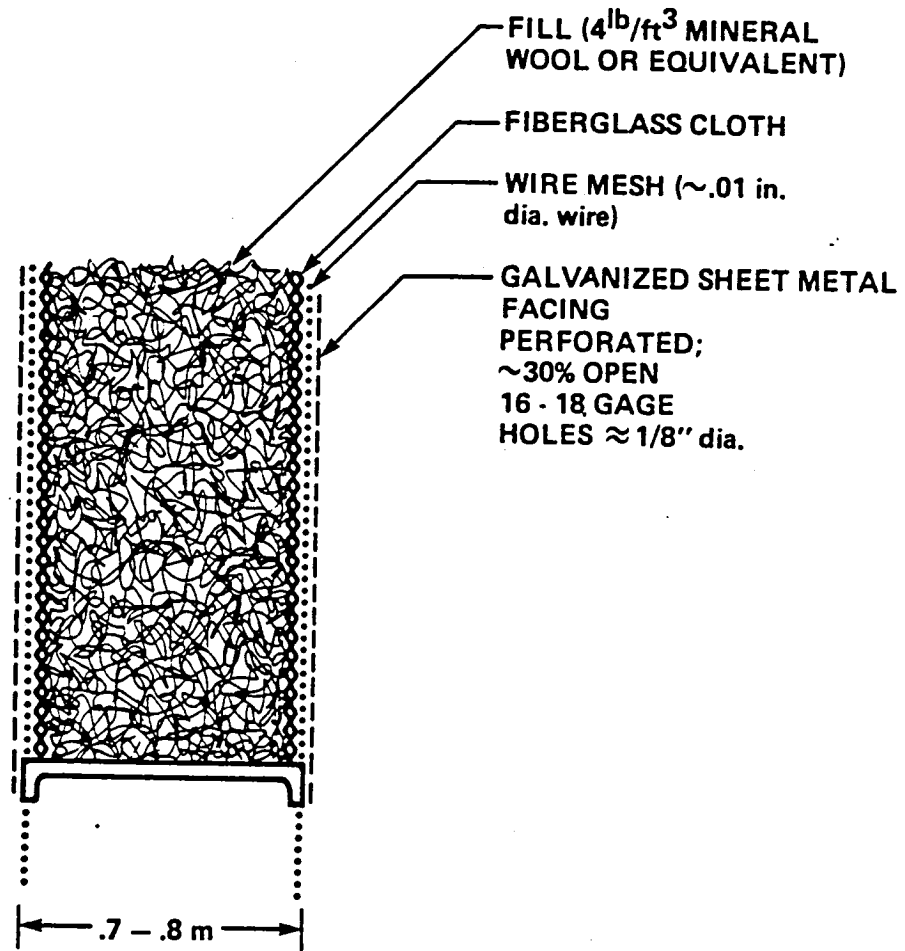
TYPICAL SECTION DETAIL OF A BULK ABSORBER
